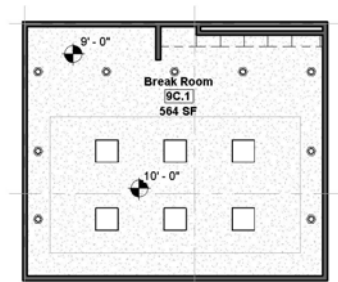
Module 9C: Break Room – Reflected Ceiling Plan
